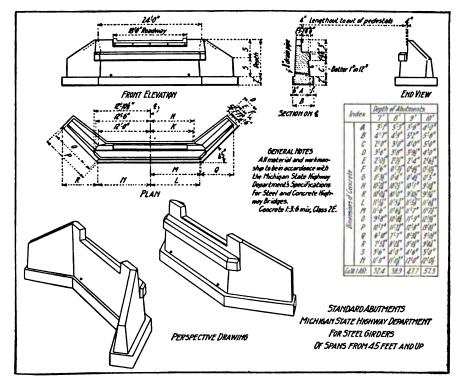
STANDARD MASONRY ABUTMENTS FOR STEEL HIGHWAY SPANS.
